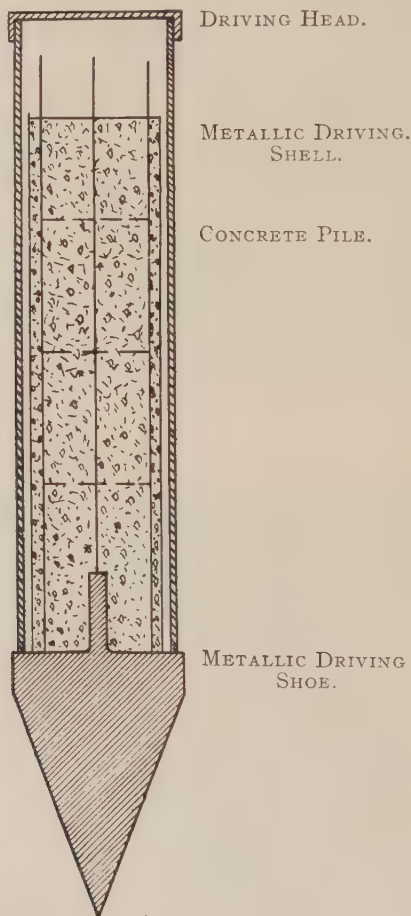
SECTION OF BRAXTON CONCRETE PILE.
